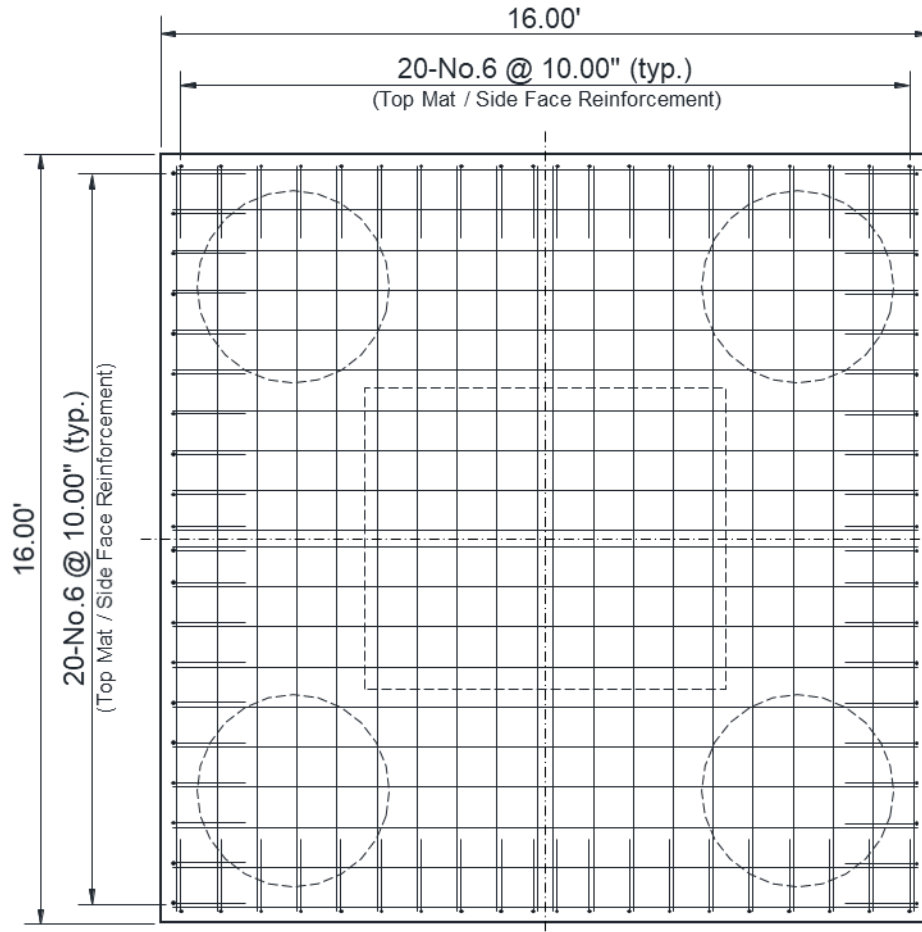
Reinforcement details for top mat reinforcement: plan view
